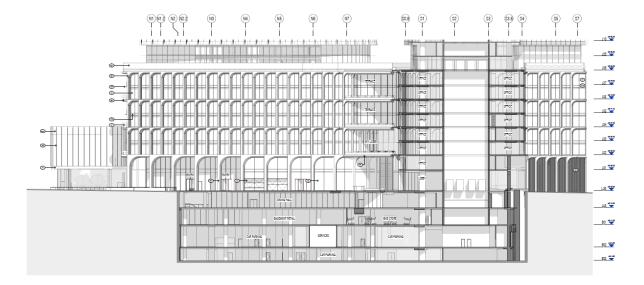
Podium Elevation and Basement Section - West (North Tower)
